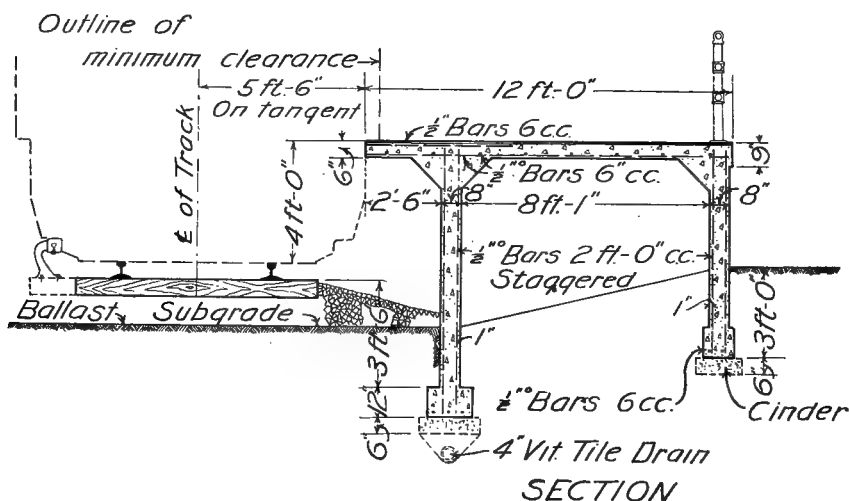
CROSS SECTION OF STANDARD OUTSIDE PLATFORM, N. Y. C. & H. R. R. R.
